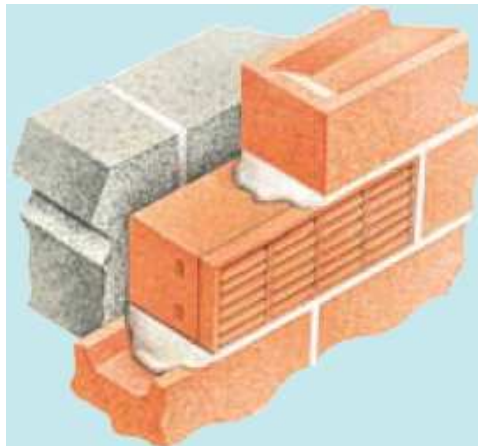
Air-brick, which promotes the ventilation of a cavity wall via a front loupered grid, can be used when the external leaf is a brick veneer (CT, 2011)
